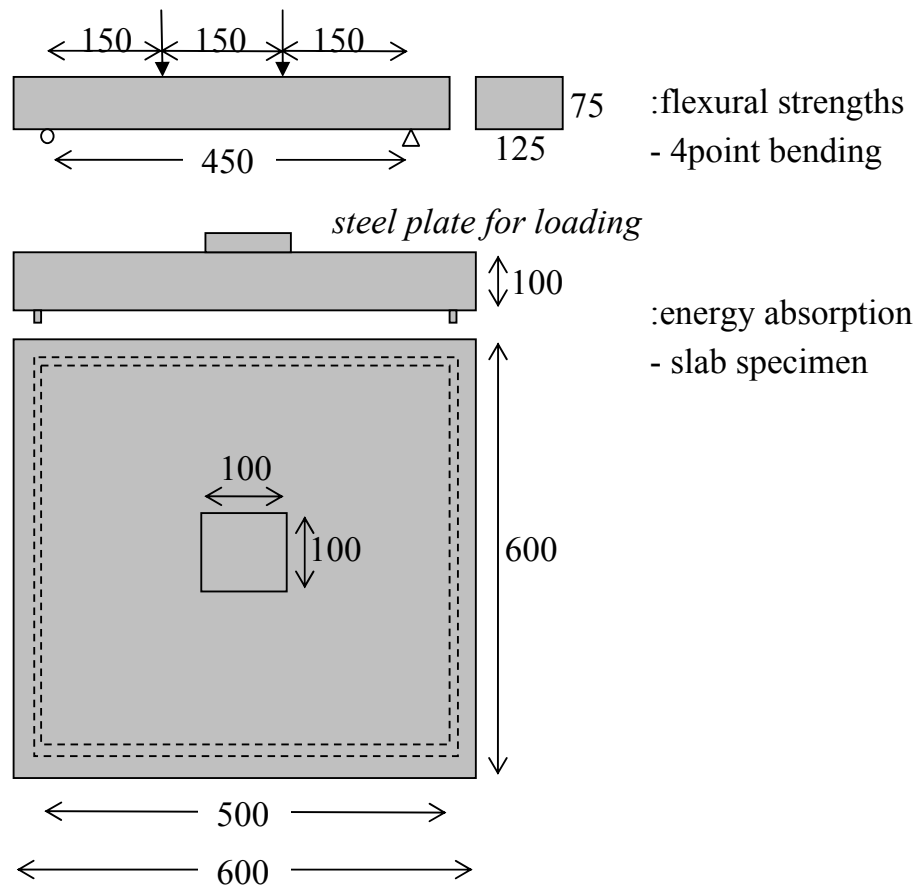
Loading of test specimen for testing of sprayed concrete according to EN 14488.
